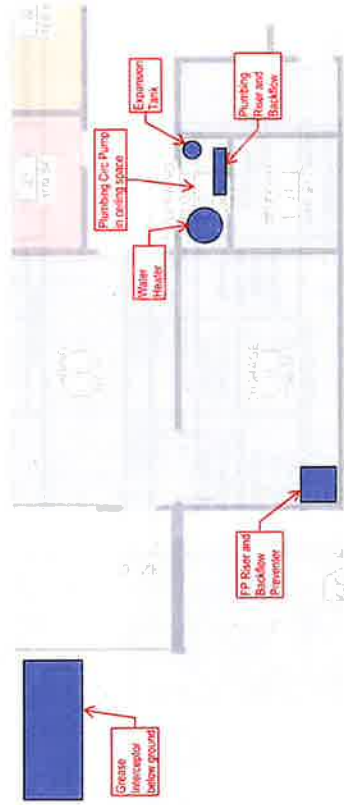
LODGE BUILDING PLUMBING EQUIPMENT
